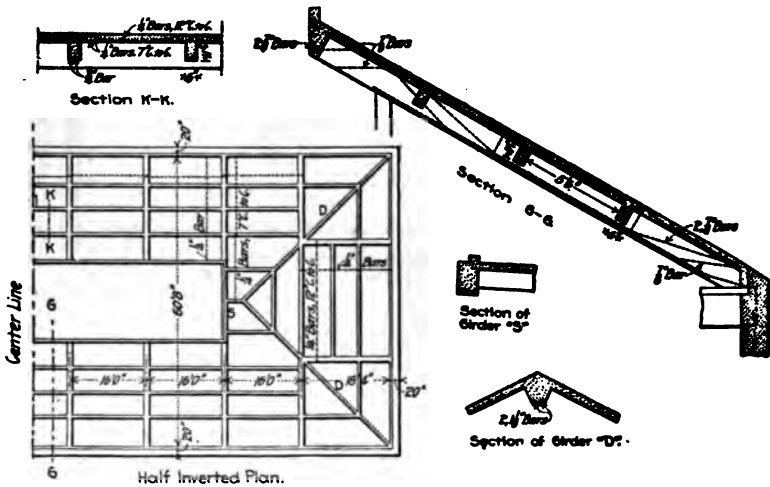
Roof Construction for Medical Laboratory Building, Brooklyn Navy Yard.
